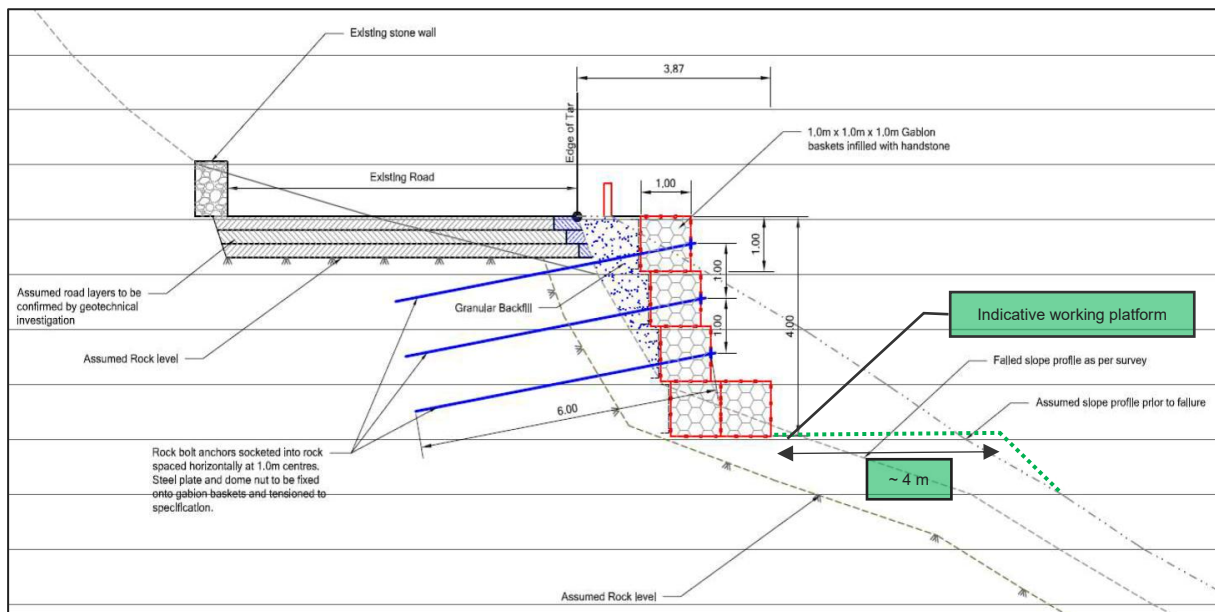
Anchored gabion wall concept (Ingerop, 2024)
